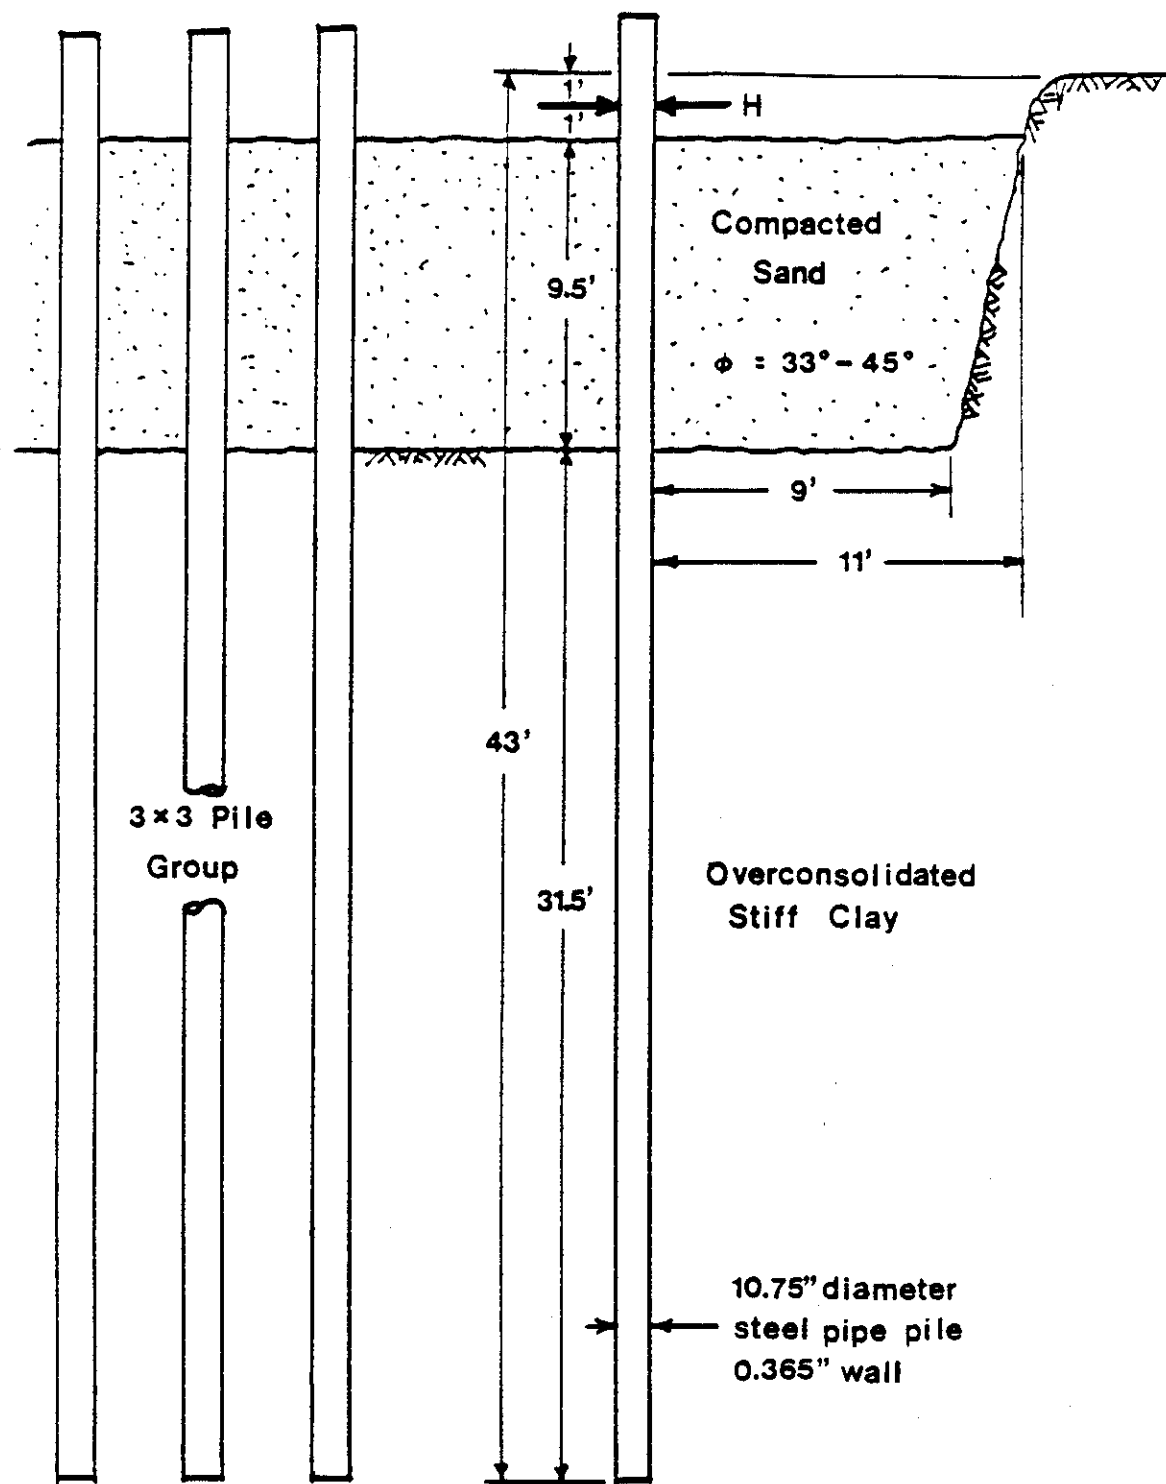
Profile of the 10.75 inch Diameter Test Pile and Soil Configuration at the University of Houston Foundation Test Facility Sand Site.
